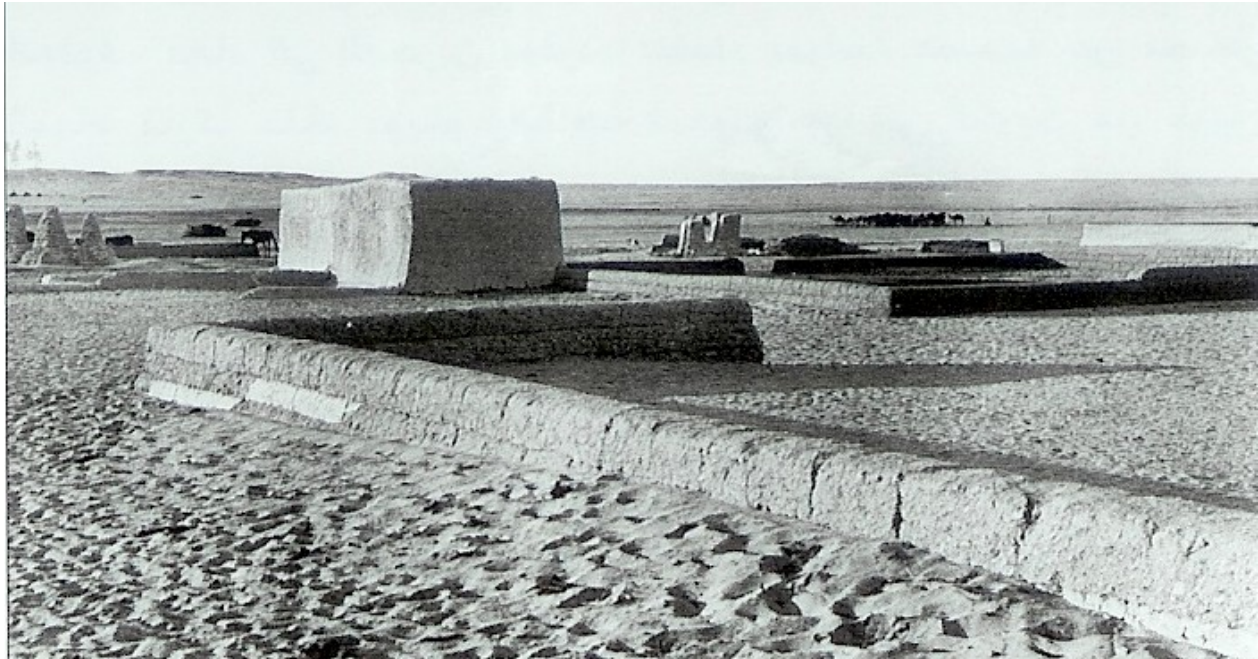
First step towards building was to do *khatta* or marking a land with a low surrounding wall. Source: Facey, 1998.
